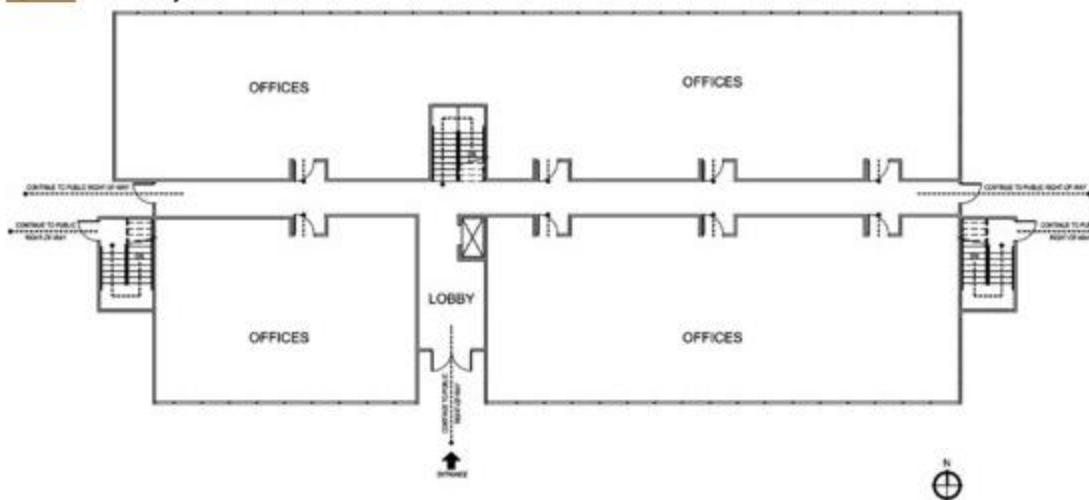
p.15 FIRST LEVEL FLOOR PLAN
